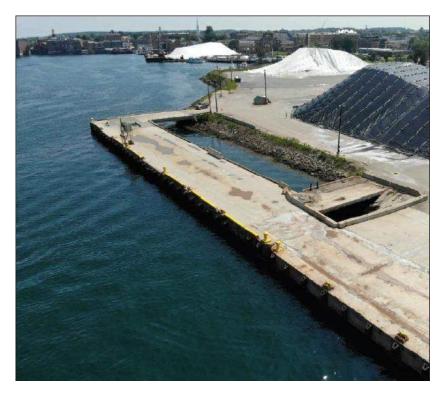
Main Wharf (1964 Vintage) – Looking Southeast
